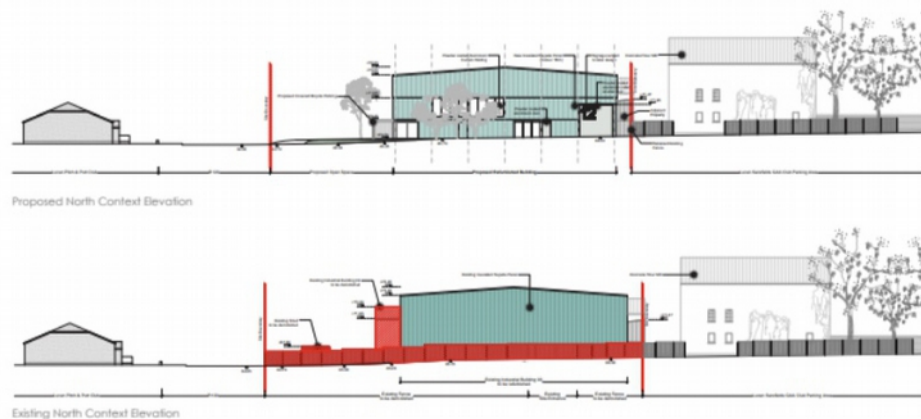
Existing and proposed north elevations. Existing site buildings hatched in red to be removed. Source: Stephen Foley Architects
